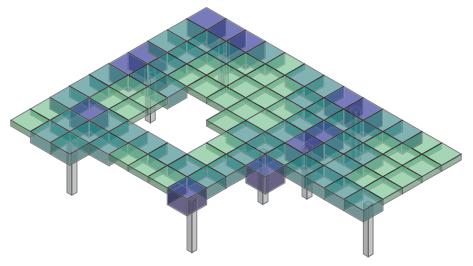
Structural system with slab elements of varying thicknesses whose arrangement adapts to the irregular floor outline and column positioning in order to fulfill deflection criteria while minimizing weight.
